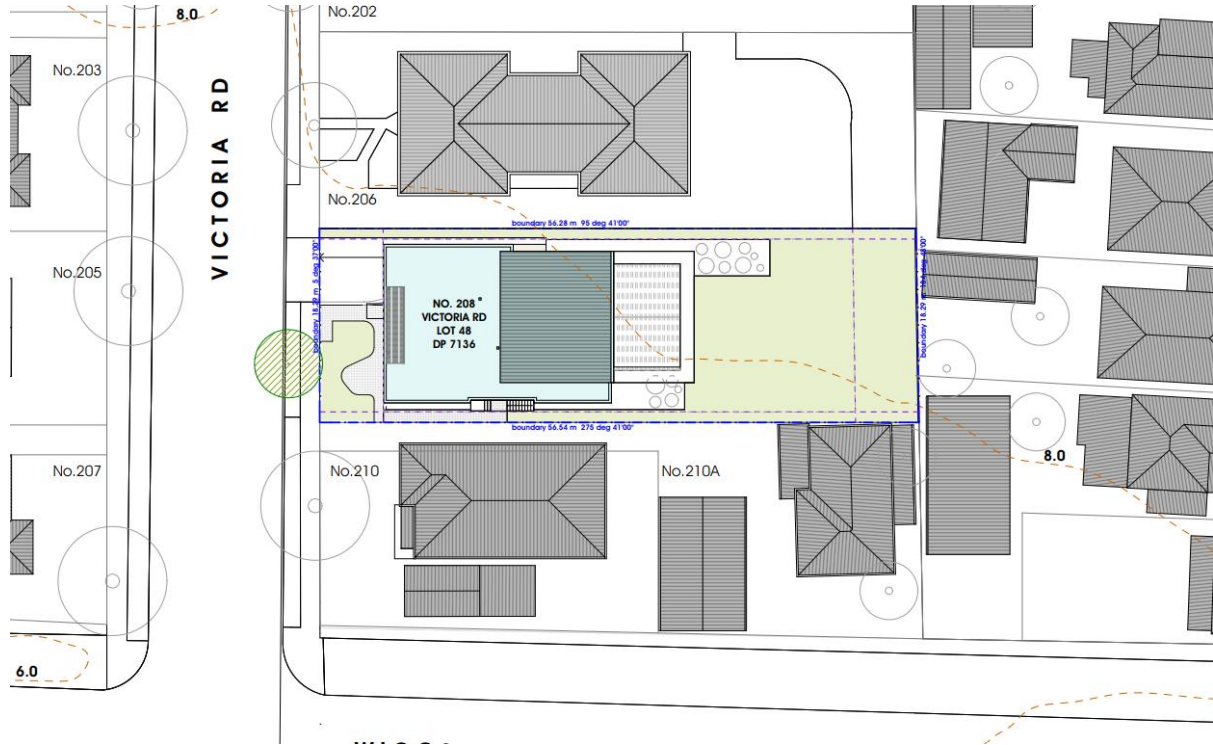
Extract of site plan (Source: Design Building Group, 2023).
